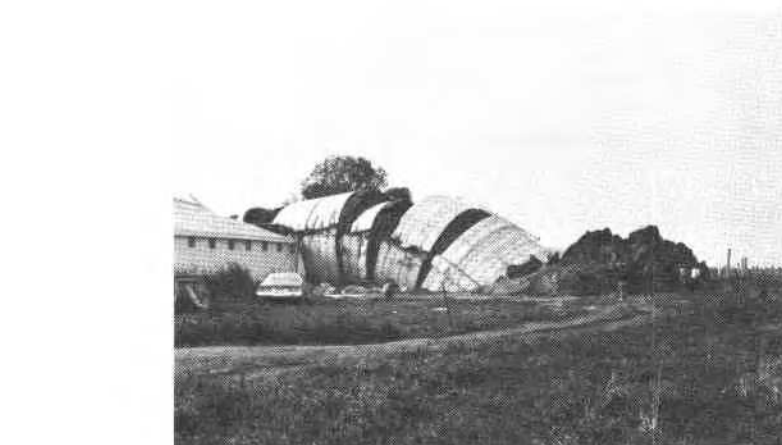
Bearing capacity failure of soil for 9.14-m diameter, 32.3-m high concrete silo at Richmond, 30 Sept. 1975.
